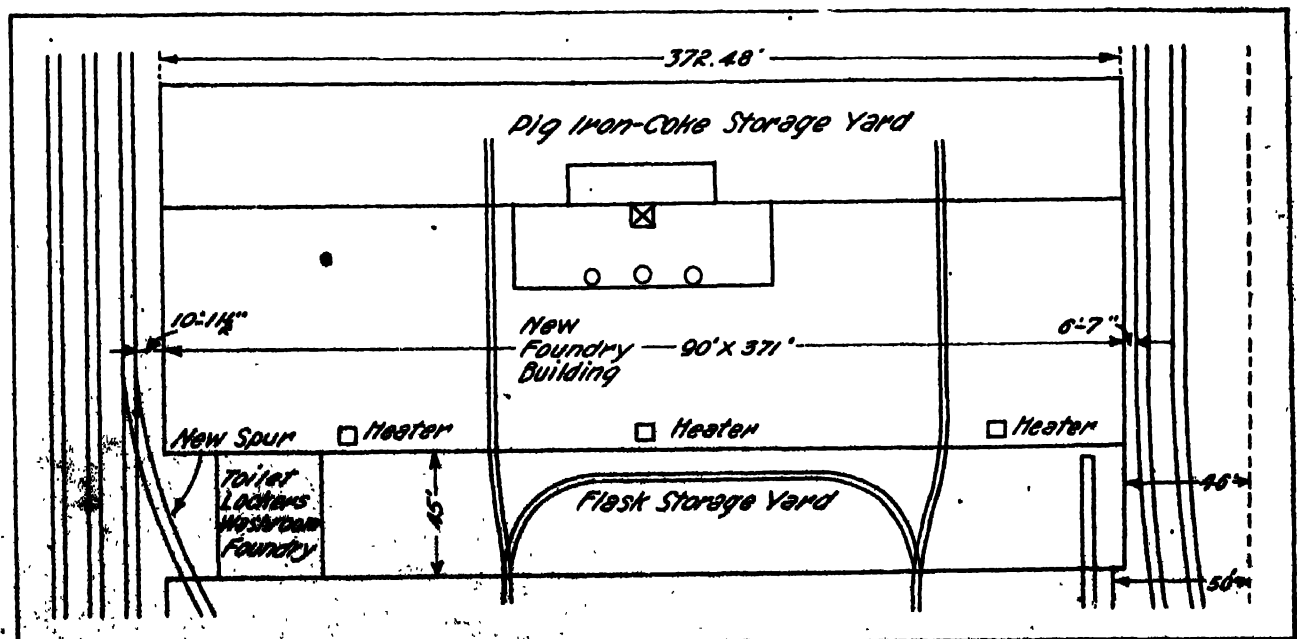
GENERAL LAYOUT OF LONG & ALTVATER'S NEW FOUNDRY, TOGETHER WITH STORAGE YARDS ON EACH SIDE
